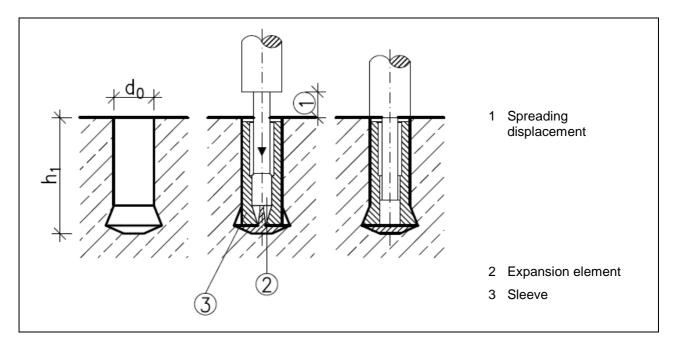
Fastener installation by hammering the expansion element (cone) into the fastener sleeve
